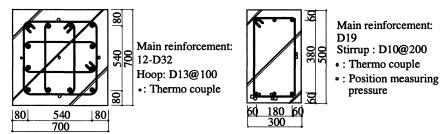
Cross section at mid height of column (left) and cross section at mid span of beam (right) (unit: mm)
